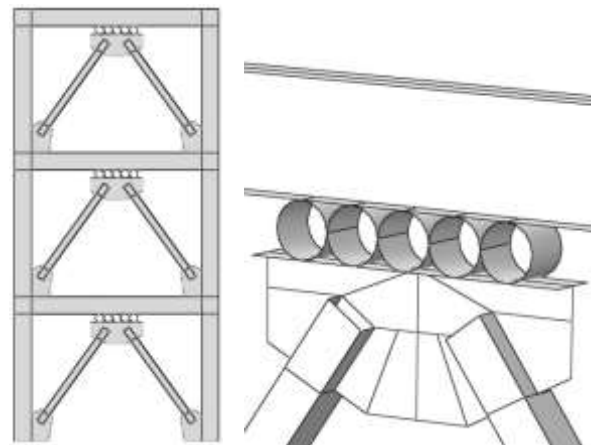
Chevron bracing frames using Multi-pipe yielding dampers.
